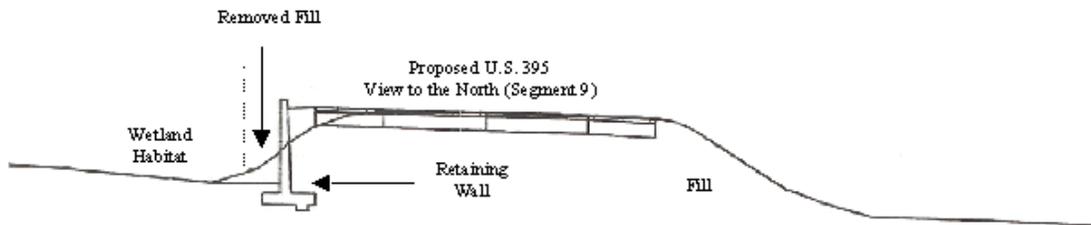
Proposed U.S. Highway 395 Cross-Section-Segment 9
